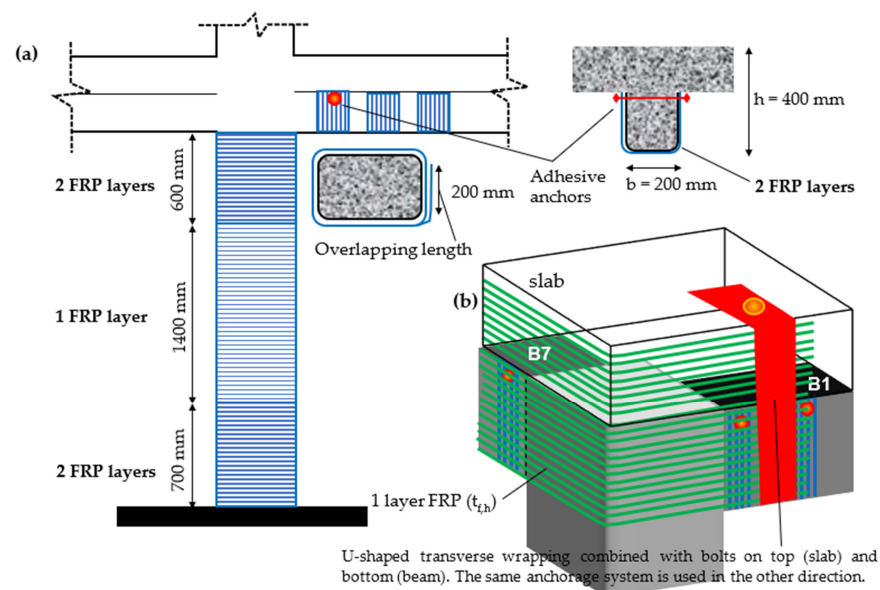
(a) FRP jacketing in ground floor columns and beam. (b) Strengthening of corner joint B1-C1-B7.
